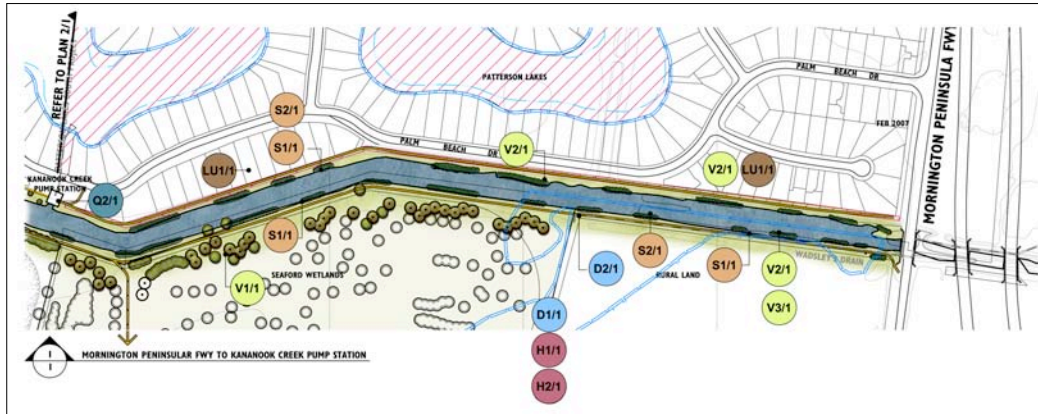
~1 EEL RACE DRAIN MORNINGTON PENINSULA FWY TO KANANOOK CREEK PUMP STATION
